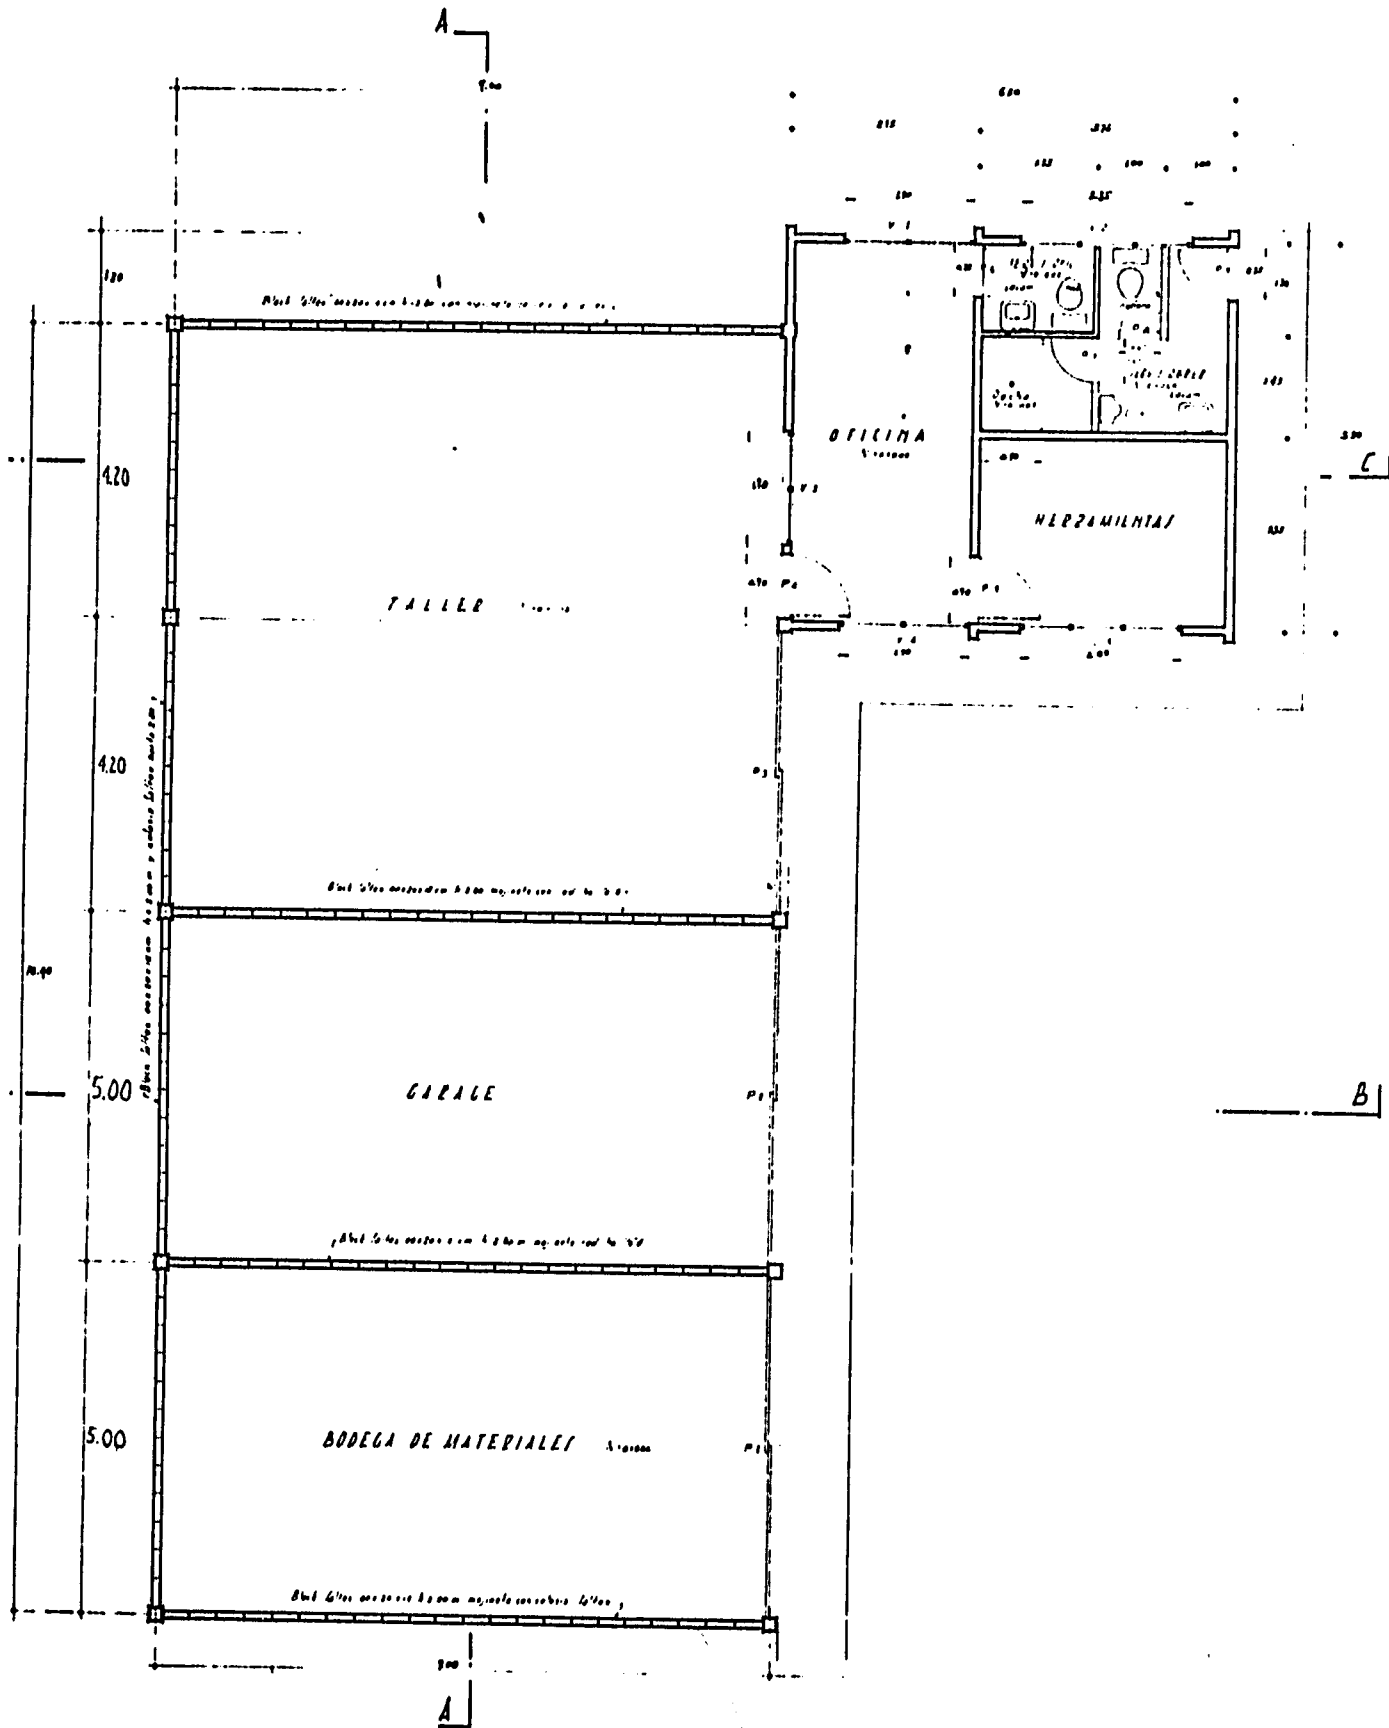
FLOOR PLAN OF WAREHOUSE, GARAGE AND SHOP BUILDING
